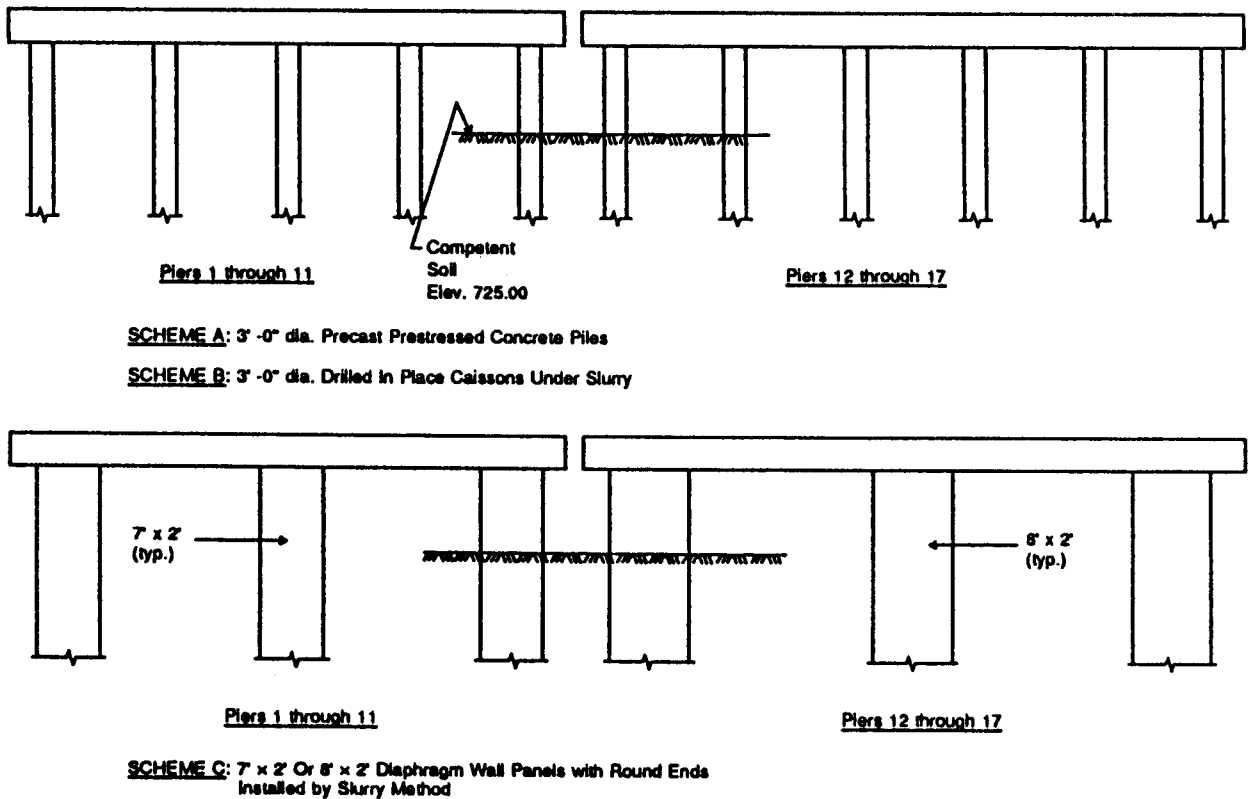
Elevation of substructure and foundation elements, bridge of design example.
